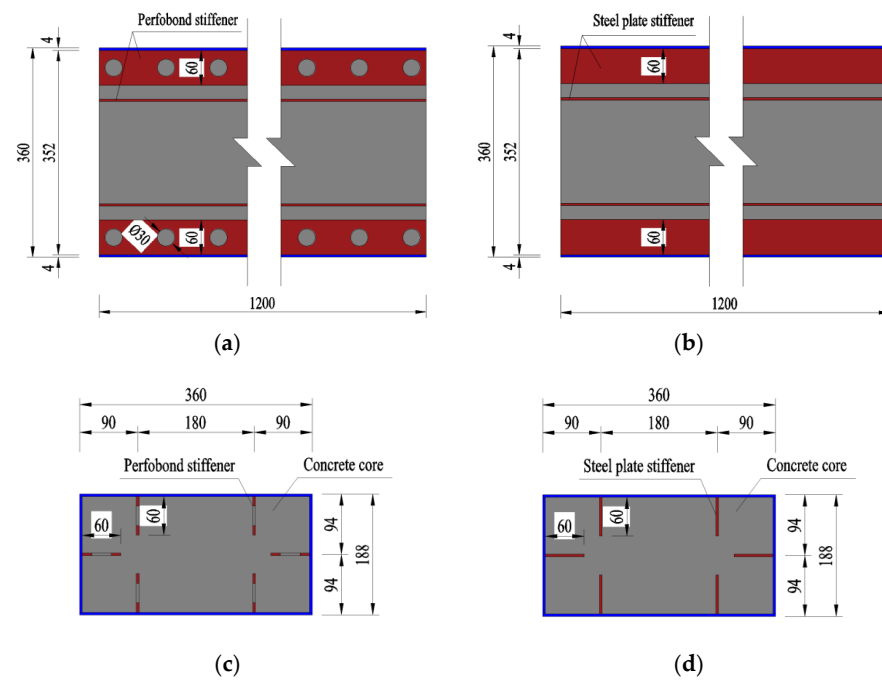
Specifications for beams with various stiffeners (unit: mm). (a) Horizontal section of perFOBOND stiffeners. (b) Horizontal section of steel plate stiffeners. (c) Sectional view of perFOBOND stiffeners. (d) Sectional view of steel plate stiffeners.
